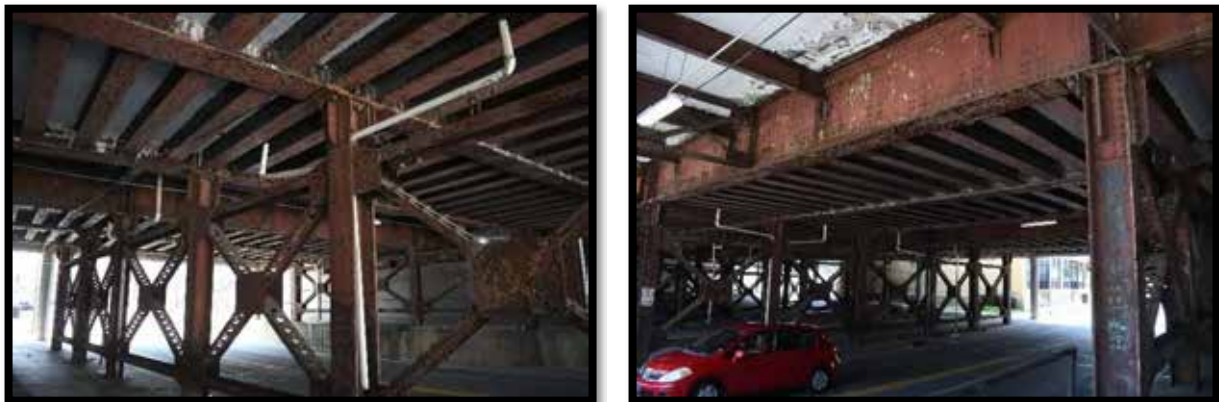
CSX Railroad Bridge No. 059R00617N. Representative examples of steel trusses, girders, and decking. Left: looking south. Right: looking west.
